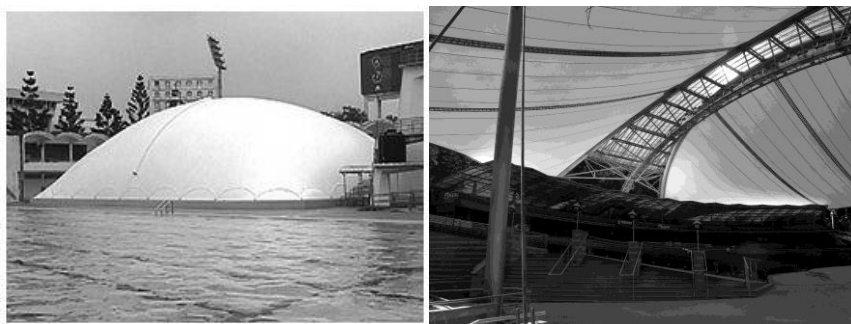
Examples of architectural fabrics applications: air supported structure - Air dome, China (left), tensile cable-membrane structure - Forest Opera, Poland (right).
